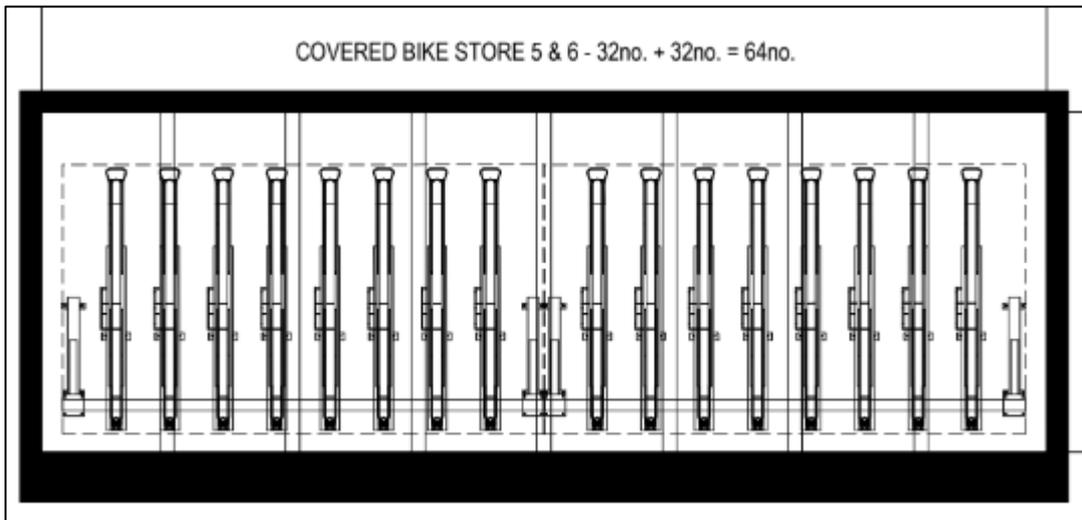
Layout of the Bike Store Nos. 5 & 6
